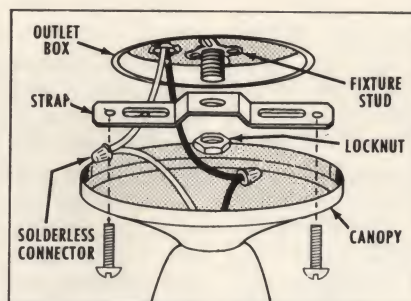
CEILING FIXTURE WITH FIXTURE STUD
